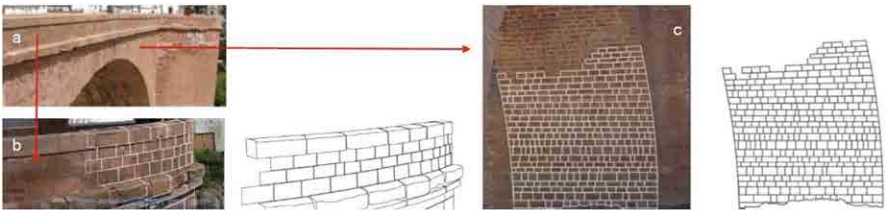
Upper and lower masonry stone system in Las Donadas Bridge, Montoro, Spain. Source (Garcia 2008) (Author 2020)
